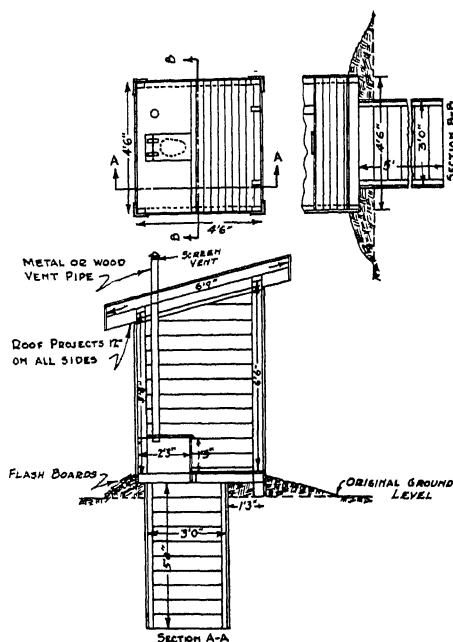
SANITARY PIT PRIVY—WOOD CONSTRUCTION.
